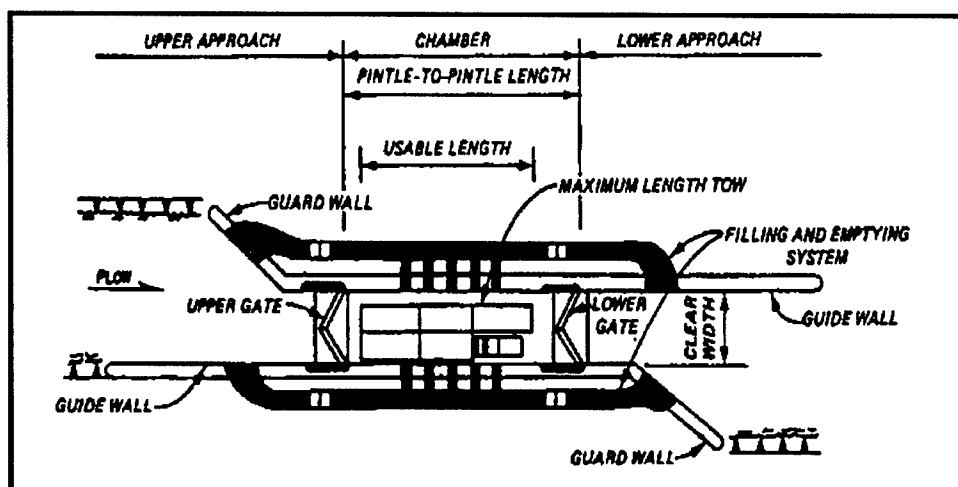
Plan view of a typical lock (ASCE 1998)
